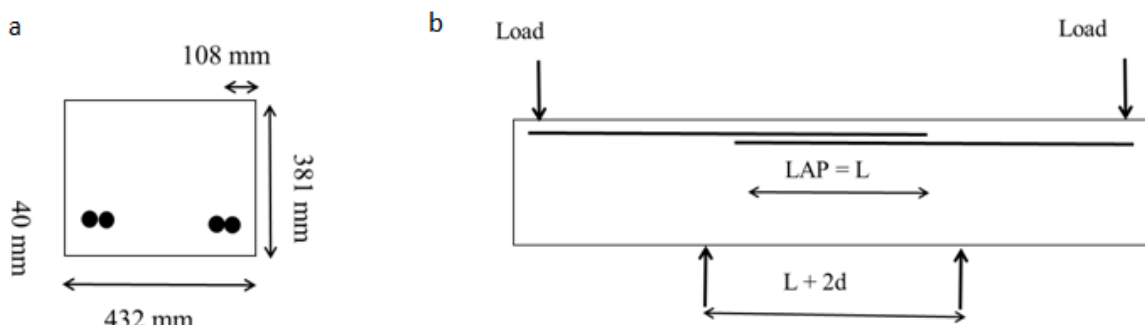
(a) Cross sectional details of specimen (b) spliced region in splice specimen
